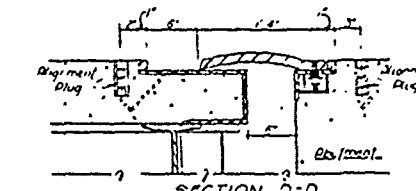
DETAIL OF ALIGNMENT PLUG (TYPICAL)
